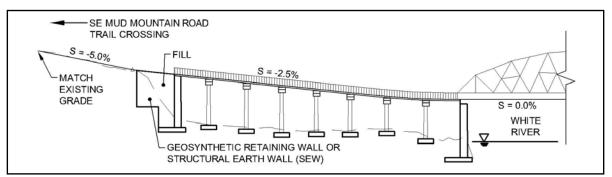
Northern White River Bridge Trail Approach – Alternative 2, Elevated Structure
